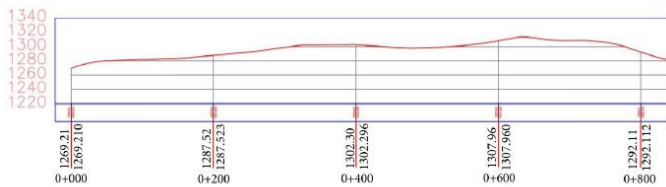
Longitudinal Section of the Existing Road (STA 0+000 – STA 0+800)
